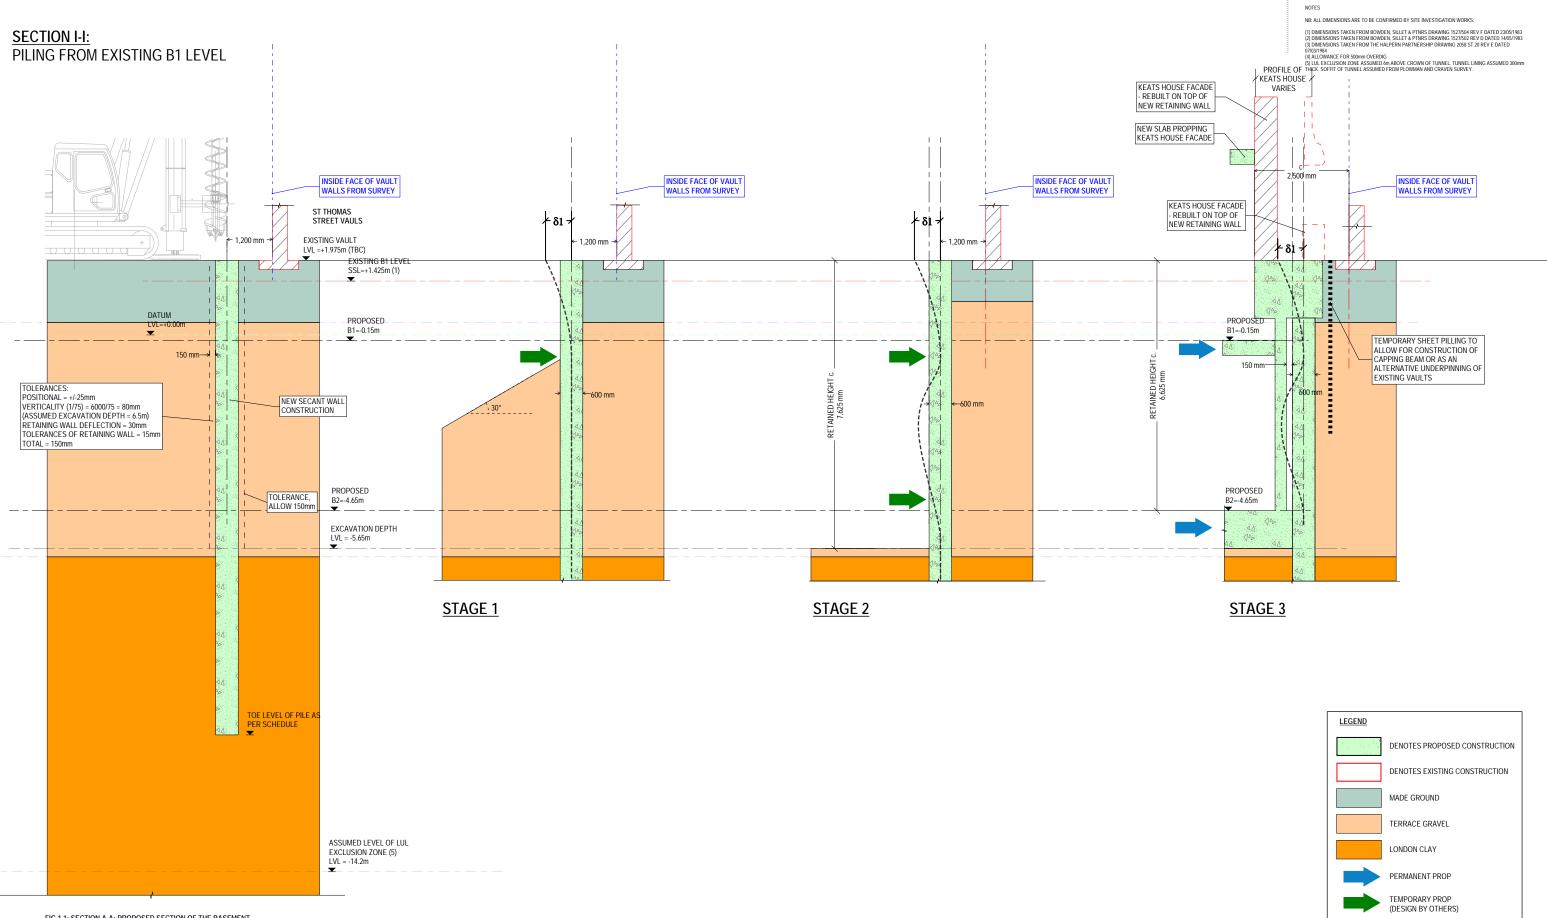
SECTION A-A: PROPOSED SECTION OF THE BASEMENT
